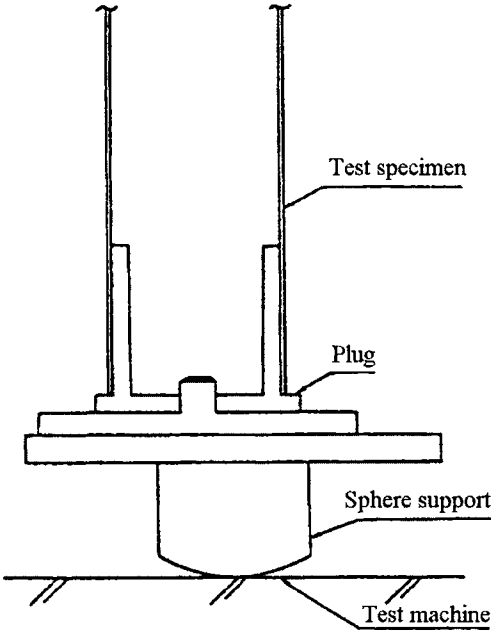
End Fixtures for Eccentric Axial Thrust of Small Scale Test Specimens
